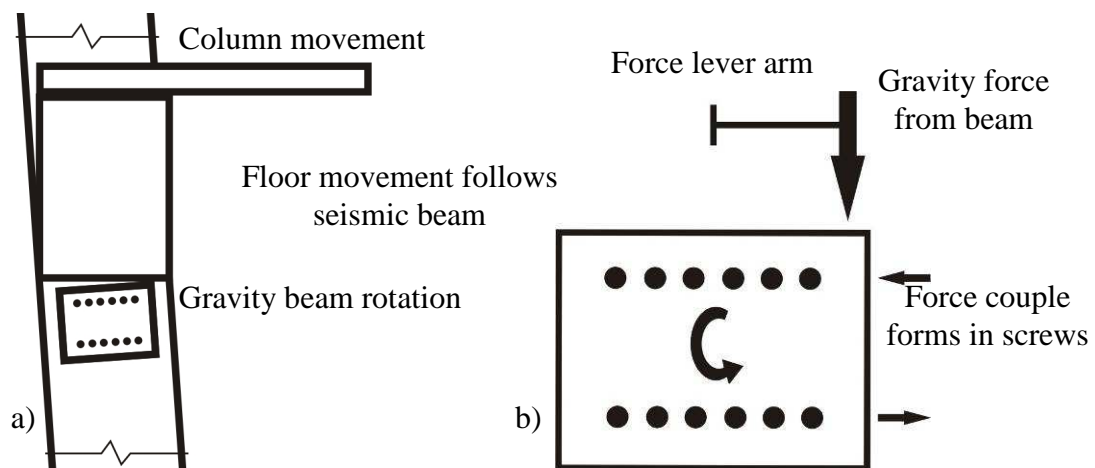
a) Movement of gravity beam b) Corbel force couple
